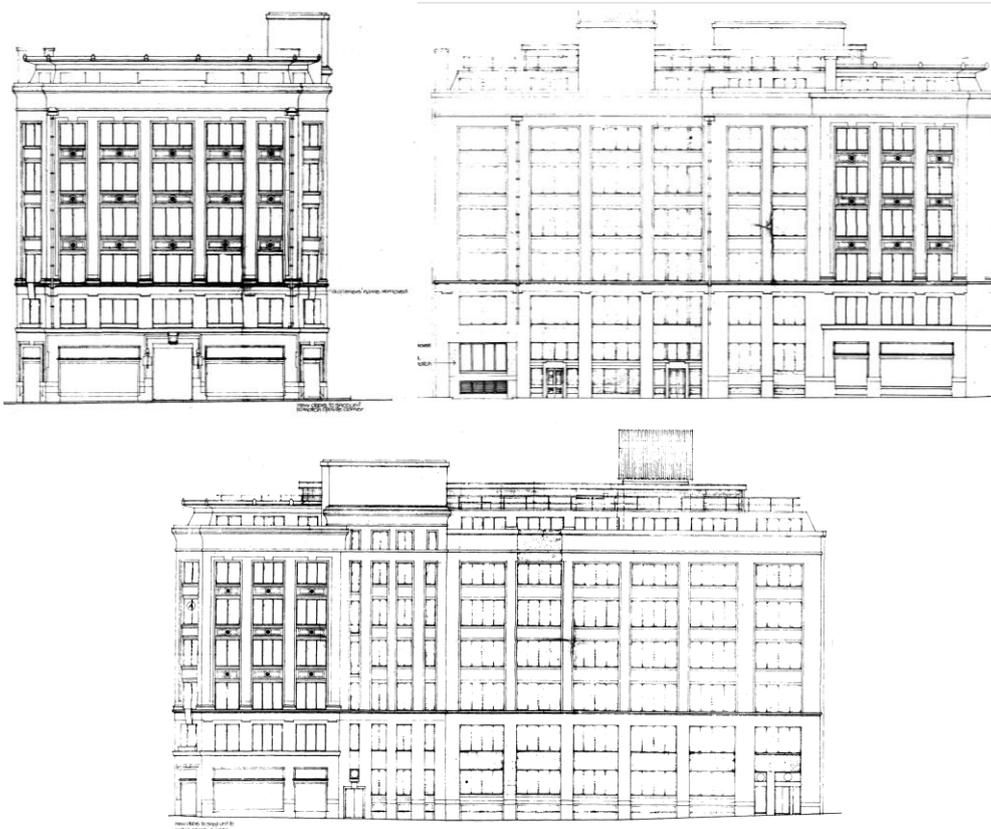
Extract from application 8600847 showing the proposed Kingsway and Keeley Street elevations (top) and the Wild Court elevation
